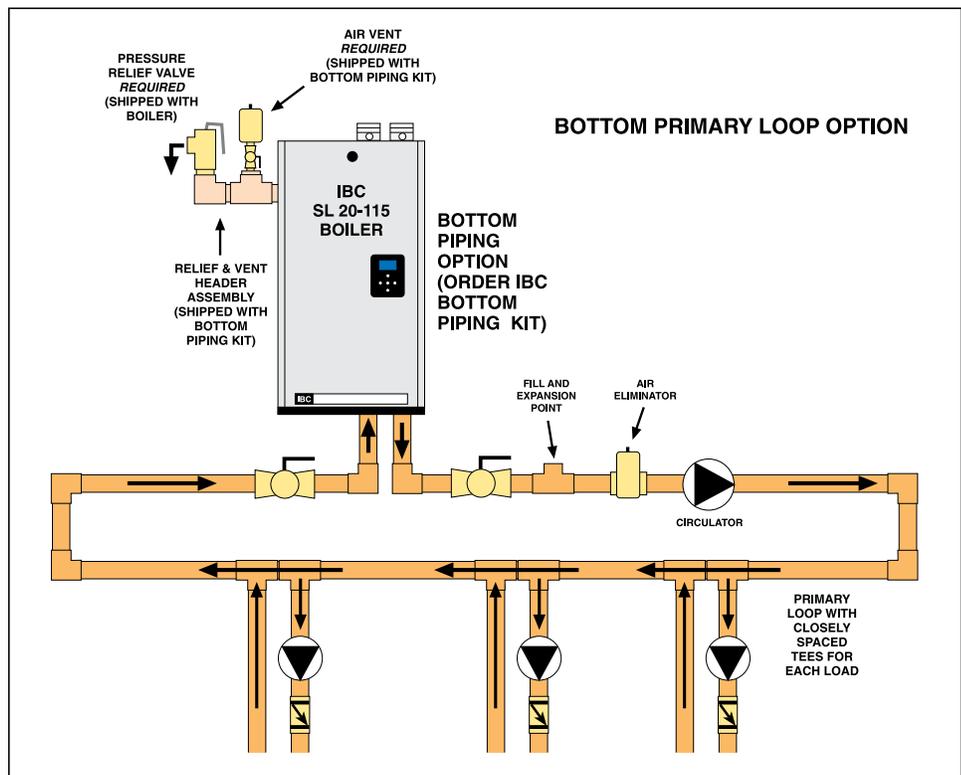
Basic Primary/Secondary piping with bottom piping connection option
